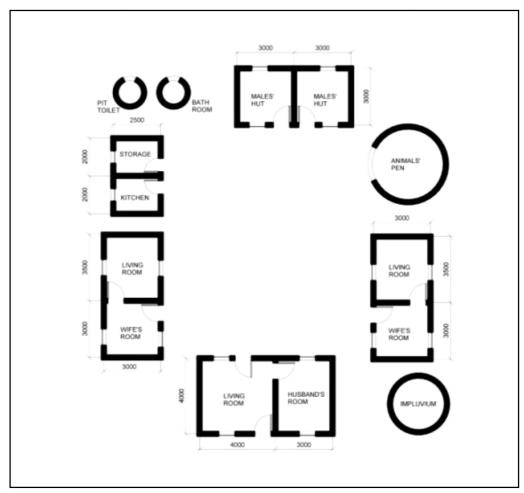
Floor Plan of Colonial Igala House Form with Impluvium. Source: Field Survey (2017).
